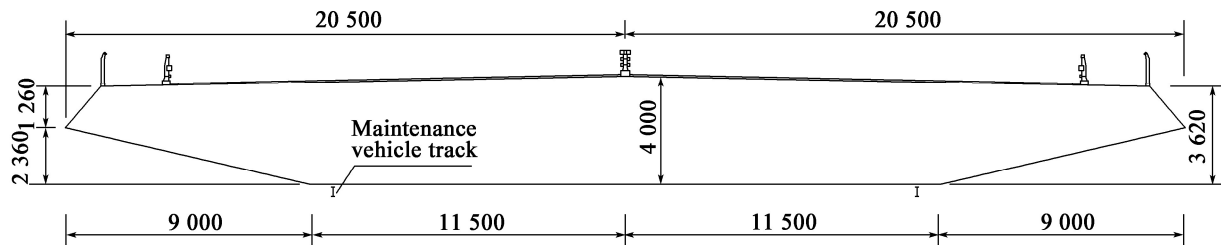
Dimensions of girder cross-section (Unit: mm)
